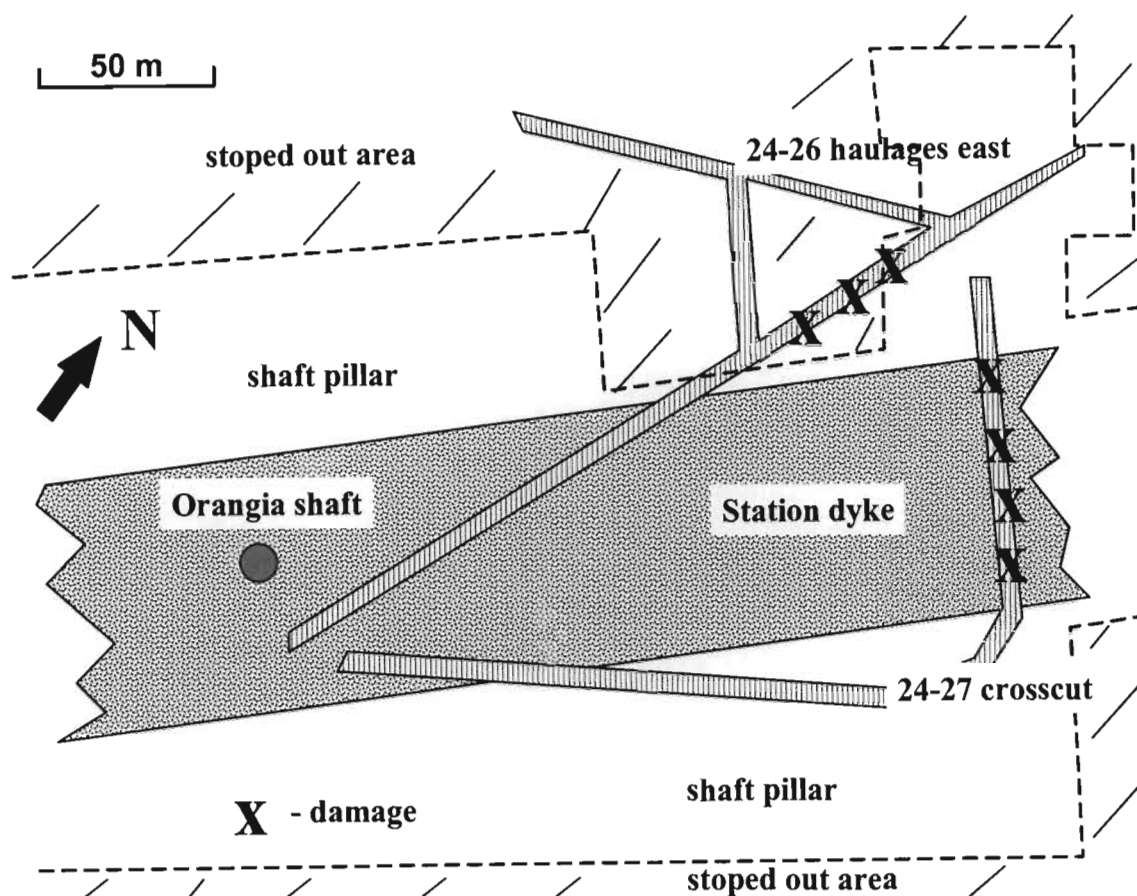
Schematic plan of 24 level tunnels where damage was observed.
